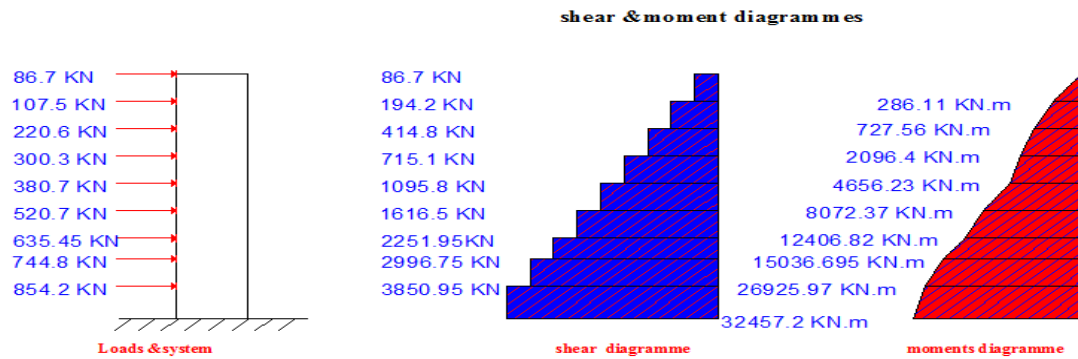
Shear force and moment diagrammes on the wall from ETABS.
